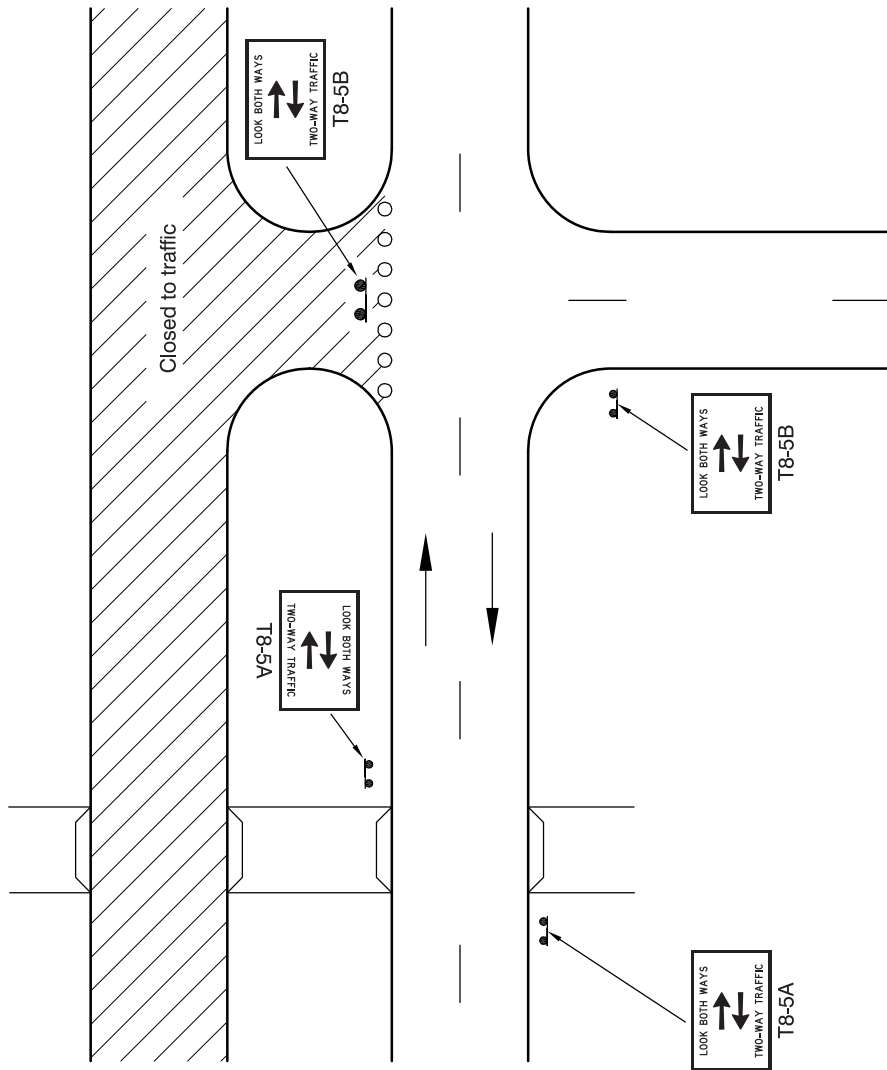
'LOOK BOTH WAYS' SIGNS
